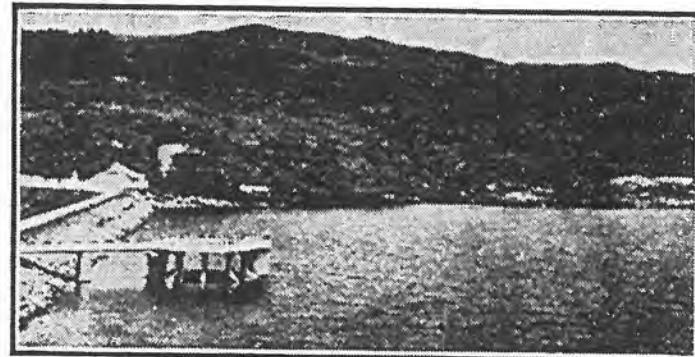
ENTRANCE, LA REGADERA DAM SPILLWAY
